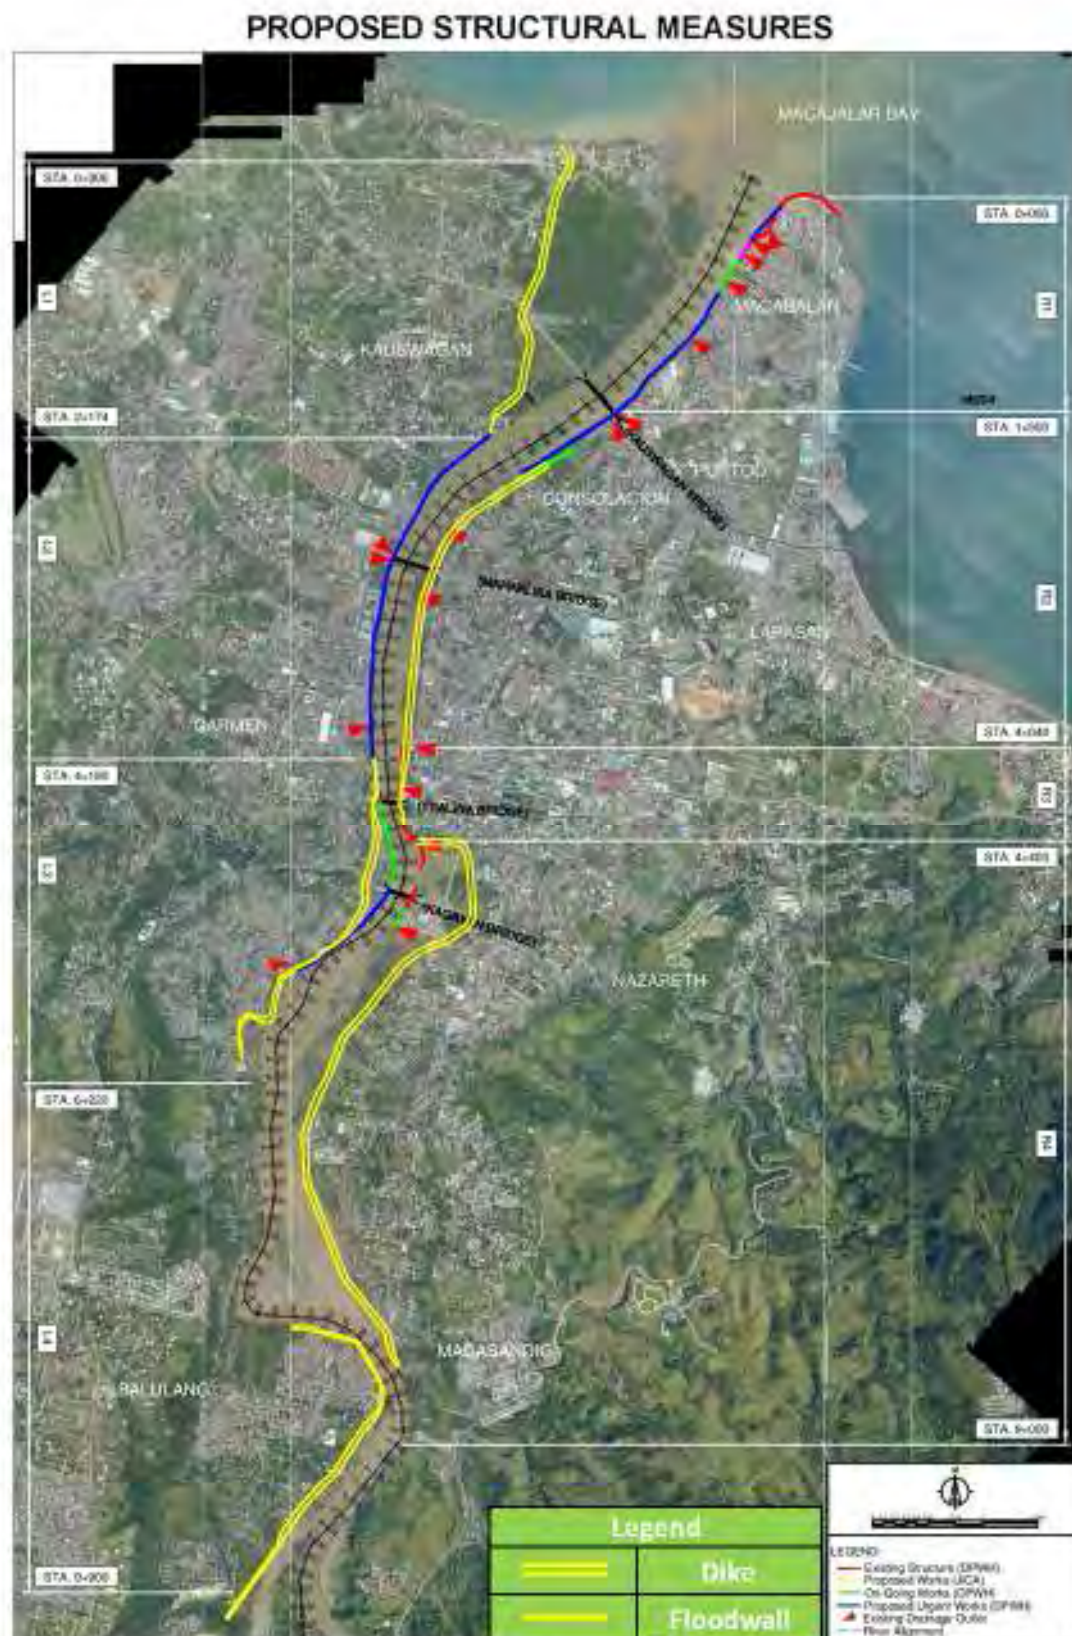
Planned Location of Dike and Floodwall of the Project
